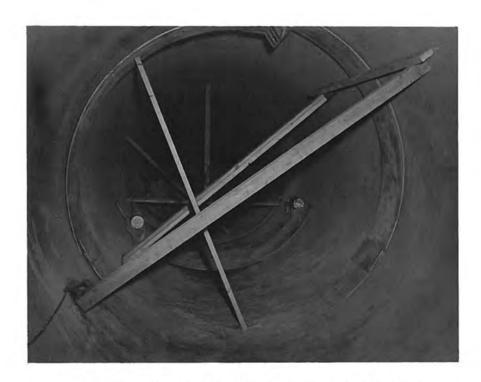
View showing installation of steel rings inside the 9-foot-diameter precast concrete conduit. P783-908 C&R-48A, April 16, 1965.
